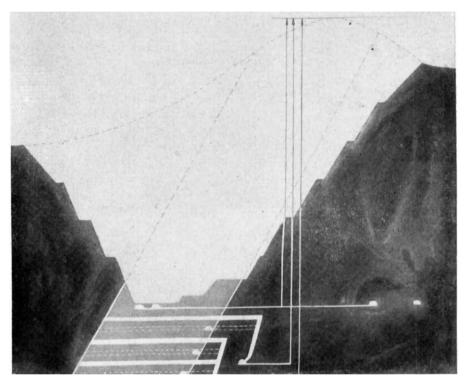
Underground mining plan at Kiruna, Sweden. Cross-section of pit and location of underground development for sub-level caving.⁽²⁾
